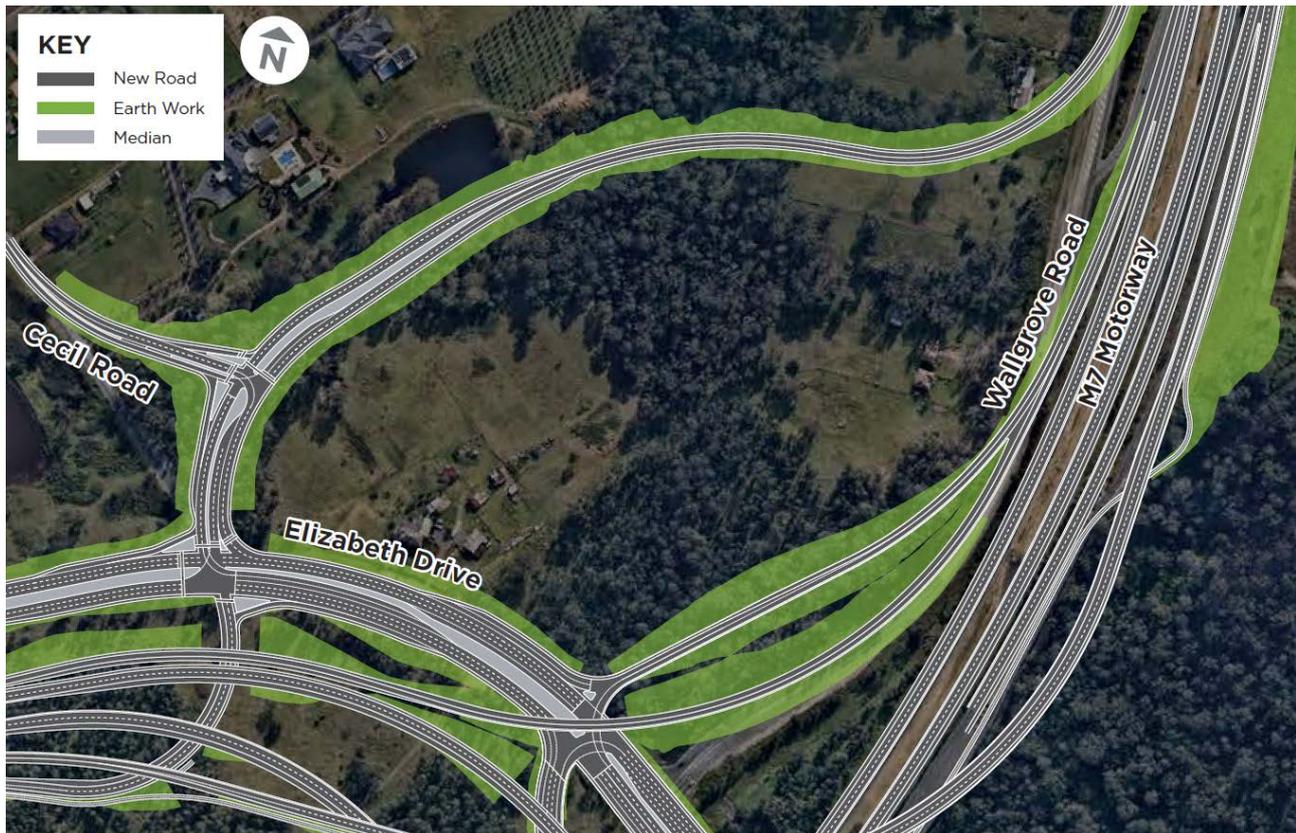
Option D - Curvature at the Elizabeth Drive and Wallgrove Road intersection
